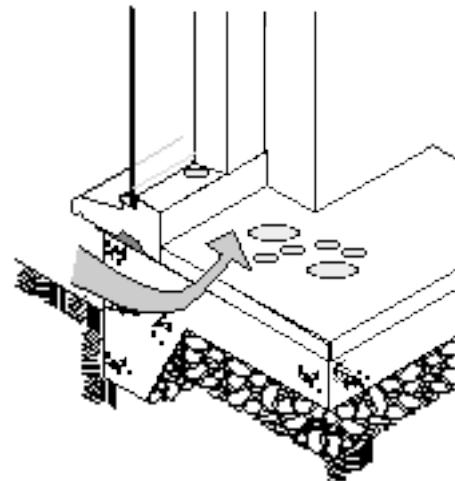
Condensation risk on an exposed edge of an uninsulated floor slab adjacent to external walls
